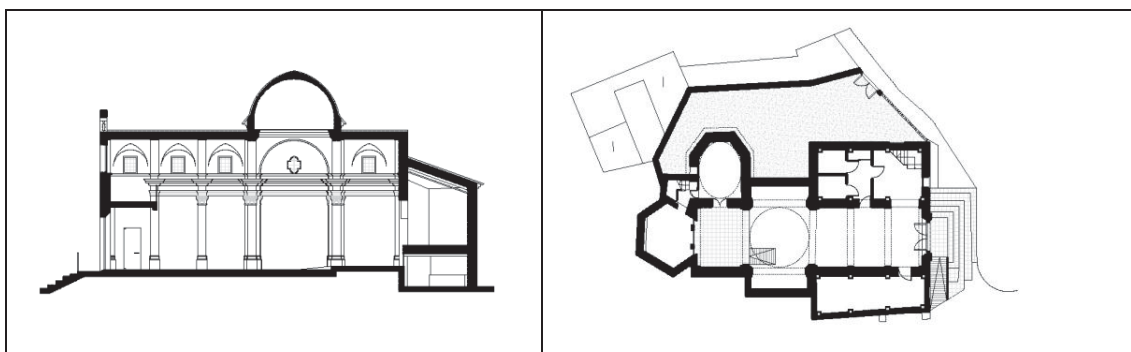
Sections and plan of the Ermita del Santo Sepulcro
